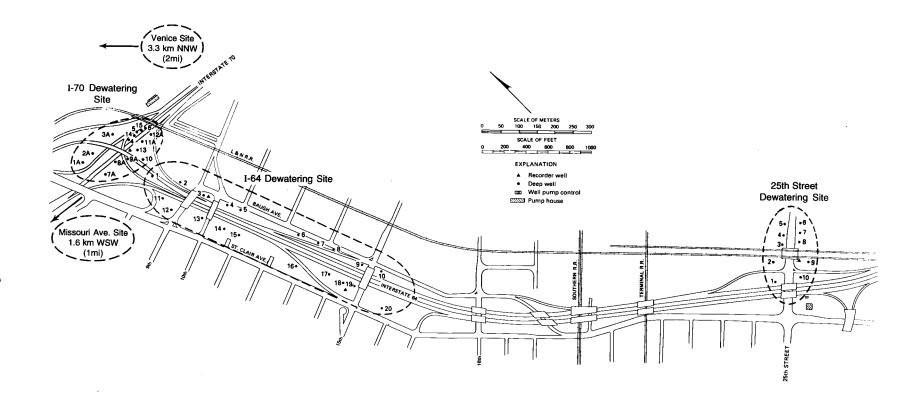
Locations of dewatering wells at the I-70 Tri-level Bridge, I-64, and 25th Street
